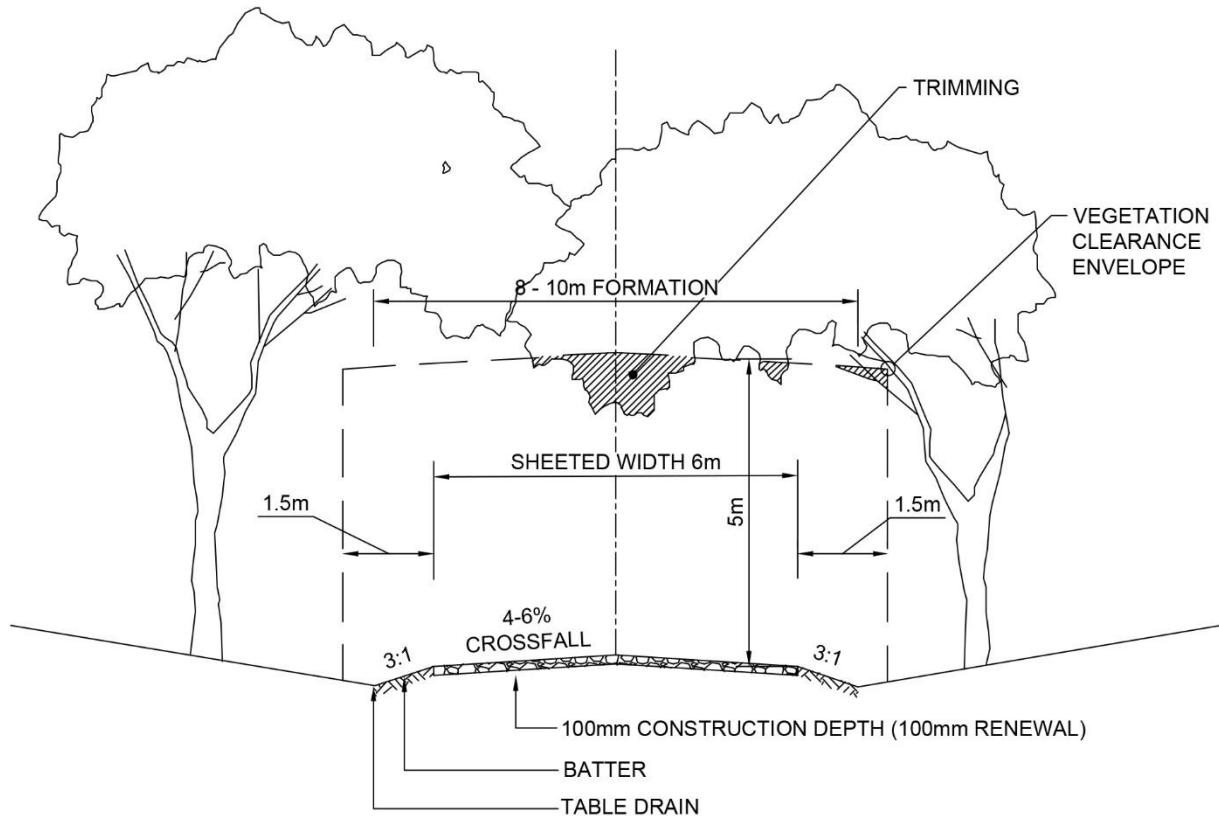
Rural Sheeted Category 4 Construction Cross Section
